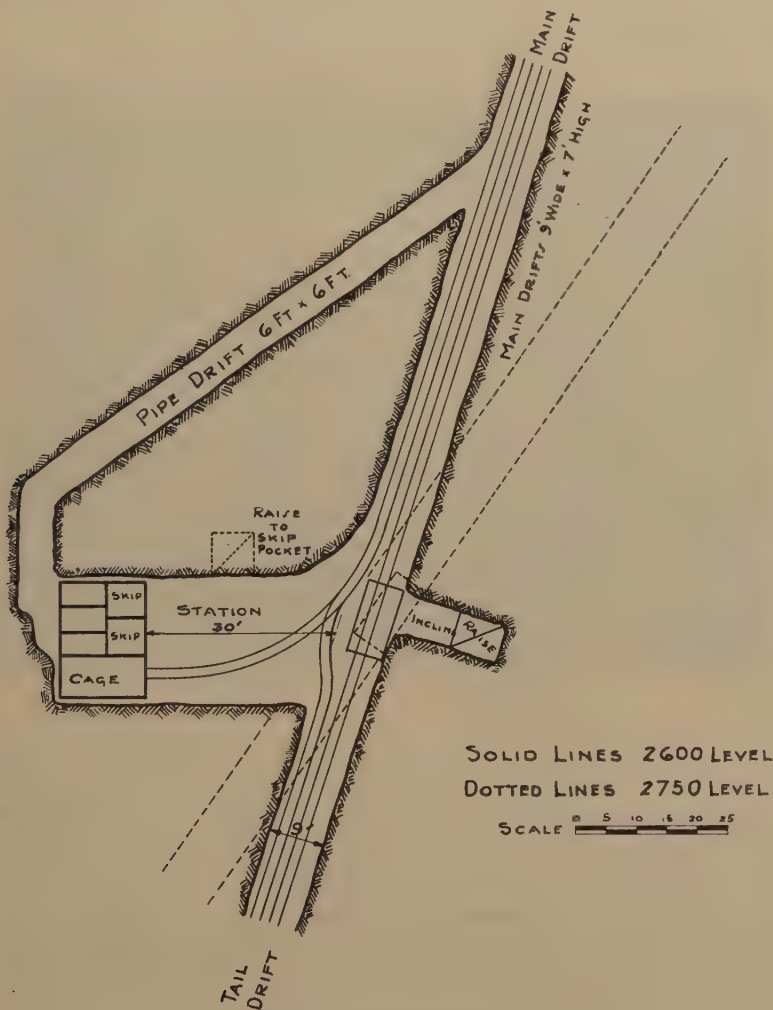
GENERAL PLAN OF SHAFT STATIONS.
